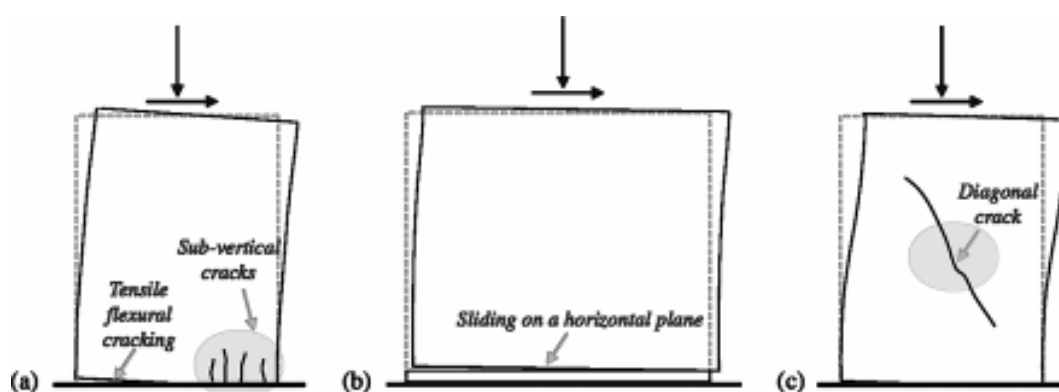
Typical failure modes of masonry piers due to horizontal loads: (a) rocking, (b) sliding shear failure, and (c) diagonal cracks (Calderini et al., 2009)
